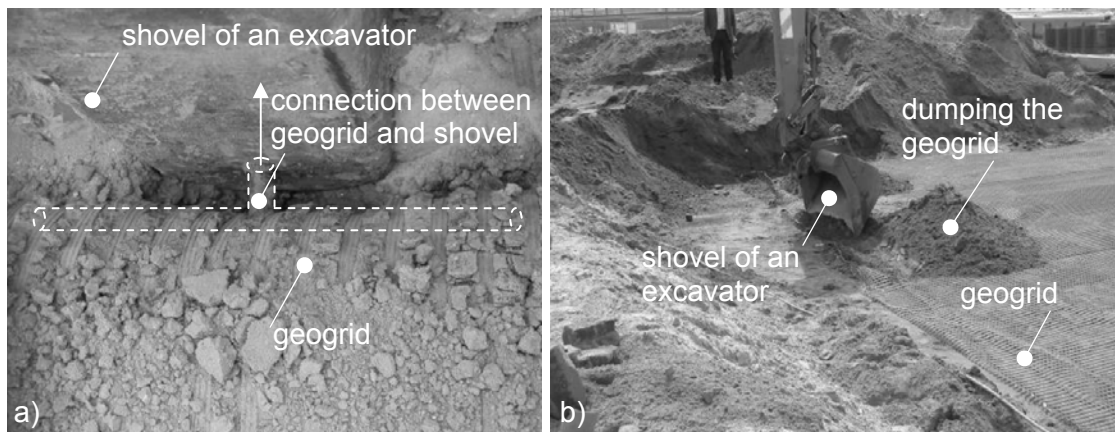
Geogrid prestressing with shovel of an excavator: a) connection detail between geogrid and shovel of the excavator b) backfilling the prestressed geogrid just after prestressing (according to Detert et al. 2004).
